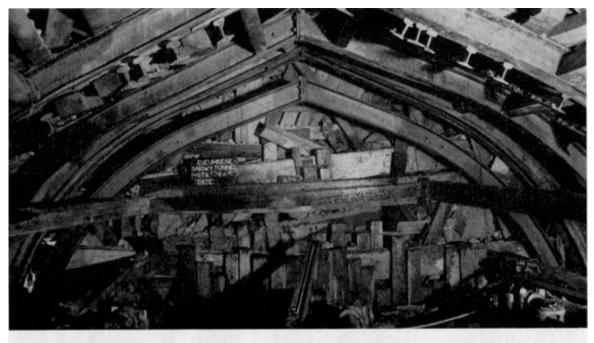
Face at Sta. 124 + 32, showing breastwork, spiling, and false steel set erected for further spiling
